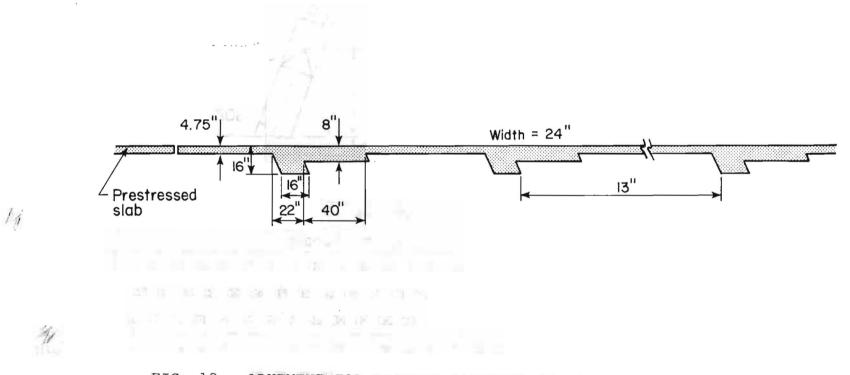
ABUTMENT FOR HIGHWAY PAVEMENT AT BOURG-SERVAS, FRANCE
